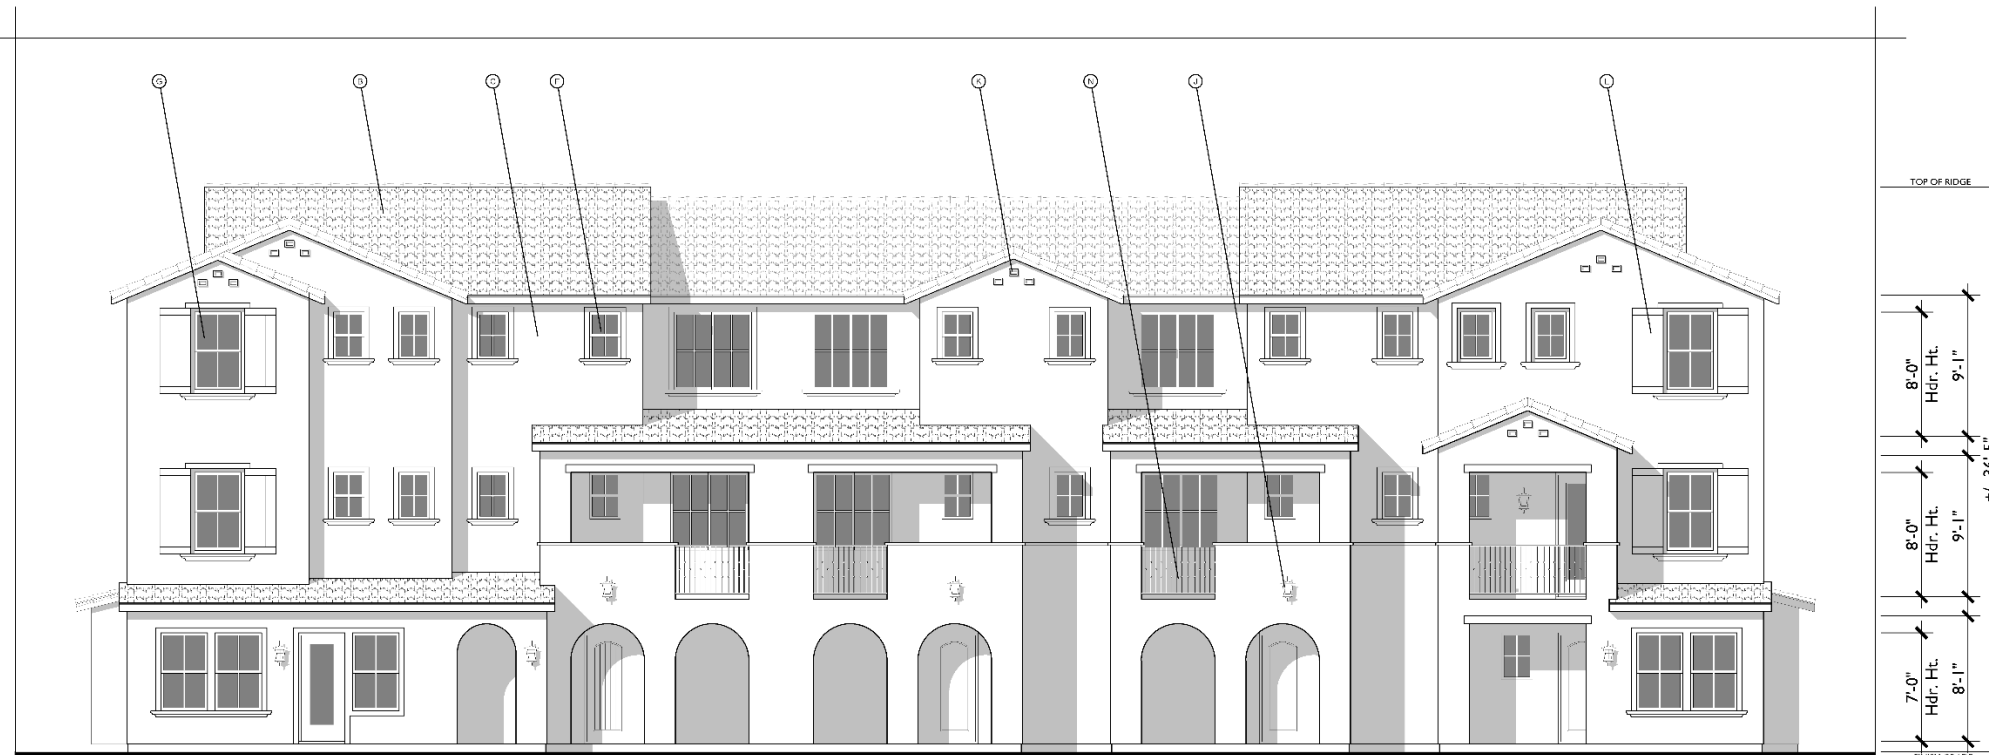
Spanish Colonial Elevation - Townhome (5-Plex) – Front and Rear
